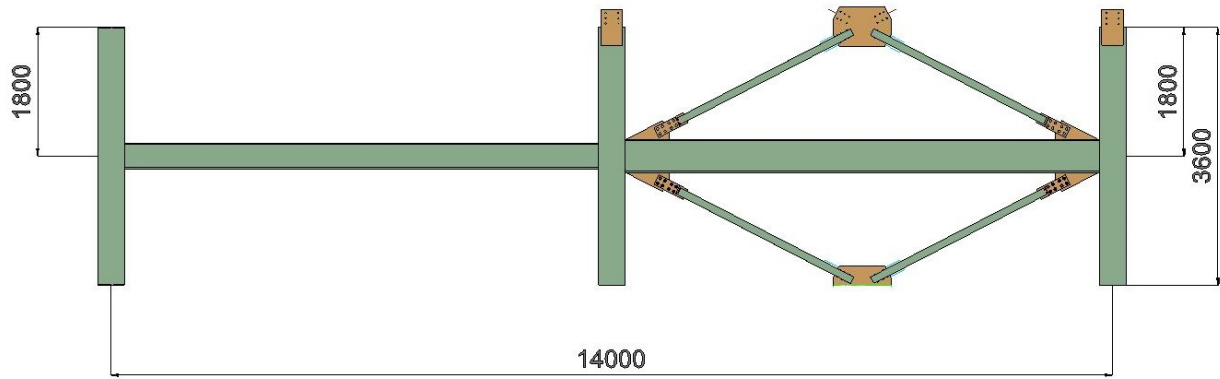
Elevation view of the proposed module (dimensions in mm)
